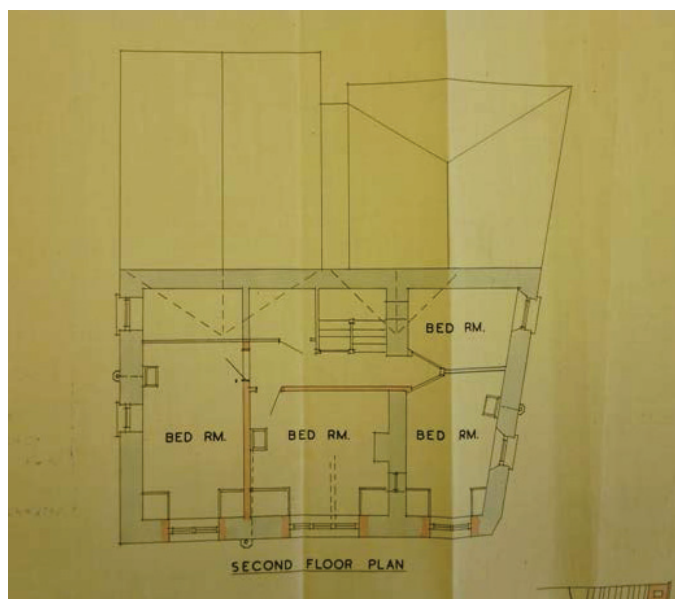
(left): Proposed second floor plan (CAC(B) BSRDNL/3/1681 1939)
